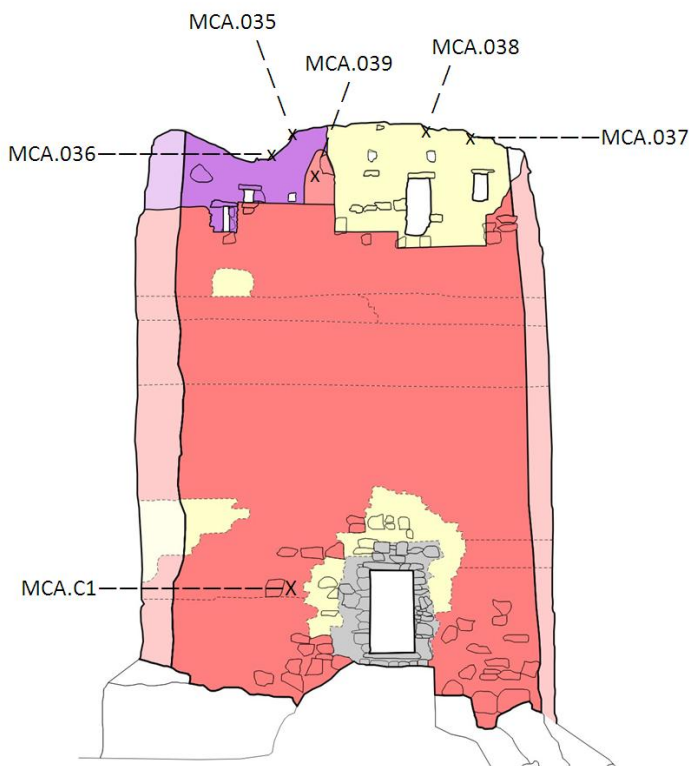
(above) – External elevation of north-west curtain wall detailing mortar sample contexts. (Underlying drawing and phasing of this elevation is in interim only; permission to use kindly received from Tom Addyman).
